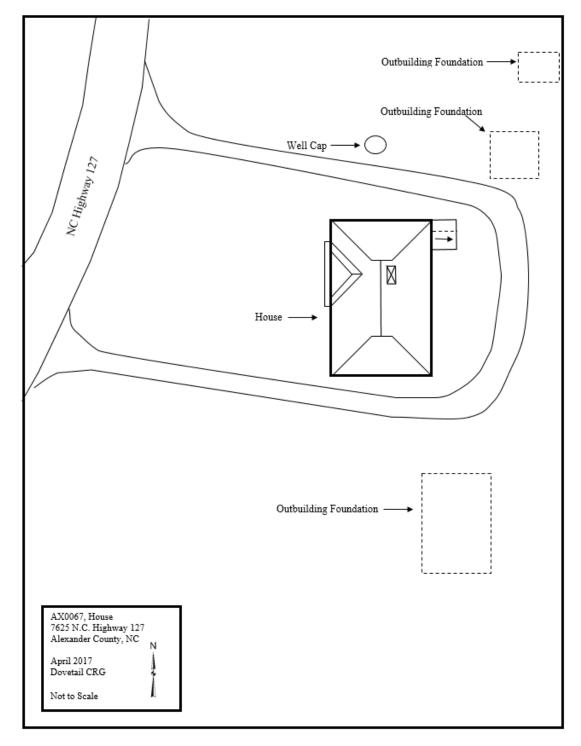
Site Plan for House at 7625 N.C. Highway 127 (AX0067).
